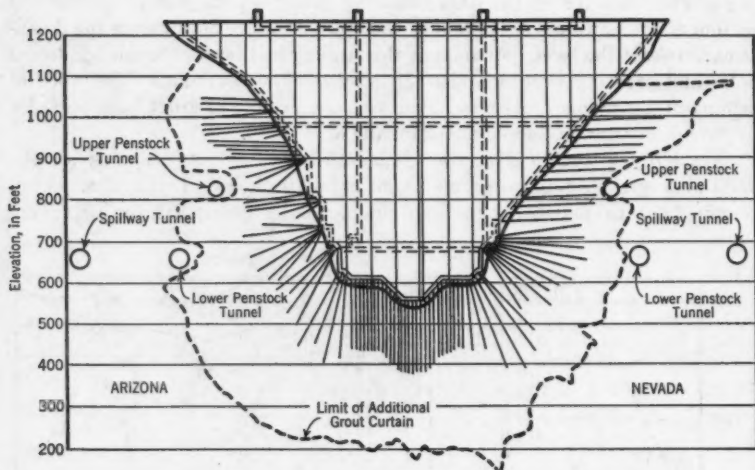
PROFILE OF DAM SITE SHOWING NEW DRAINAGE SYSTEM
